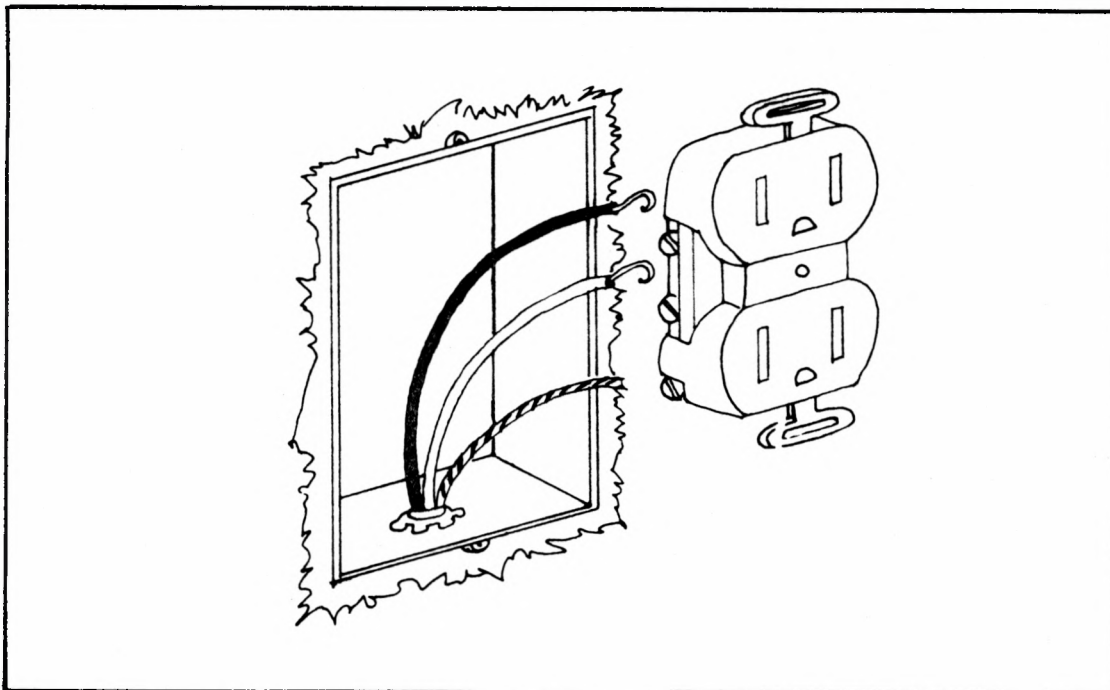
WALL RECEPTACLE WITH GROUNDWIRE
